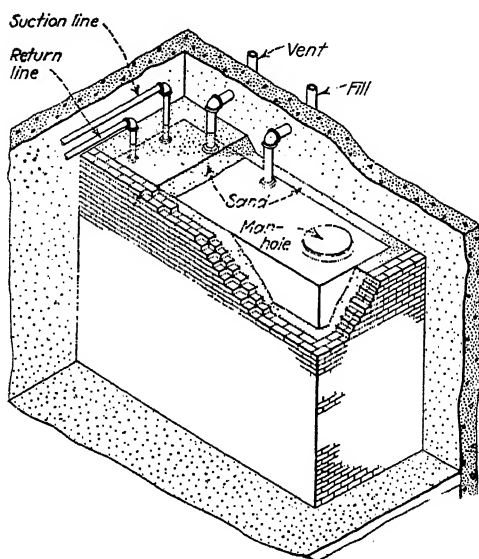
Basement oil storage tank and connections, with brick enclosure and sand fill.
